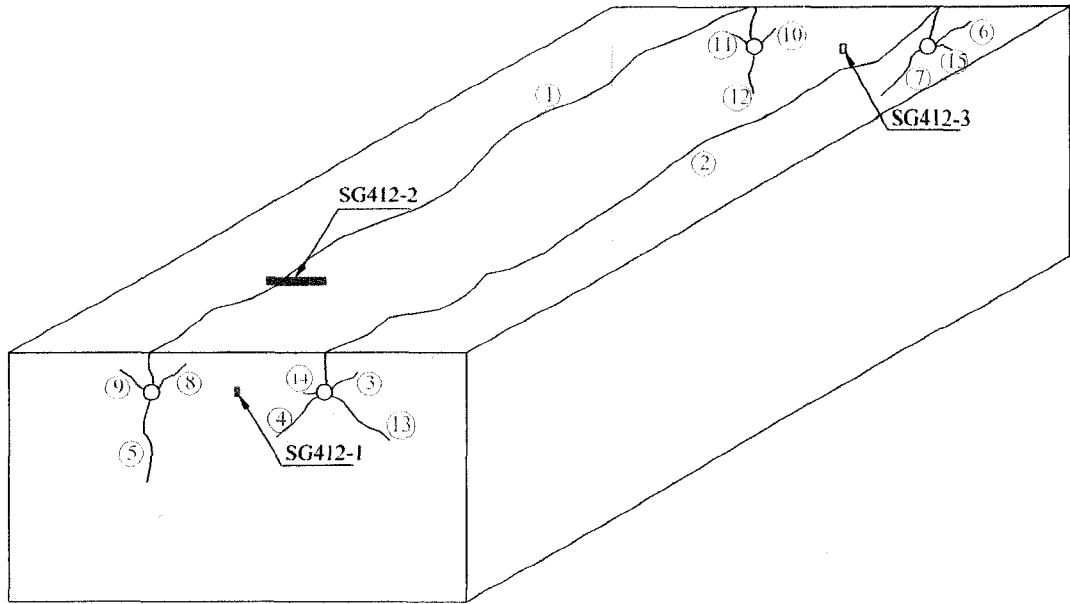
Cracking pattern in specimen SG 460-16-2
